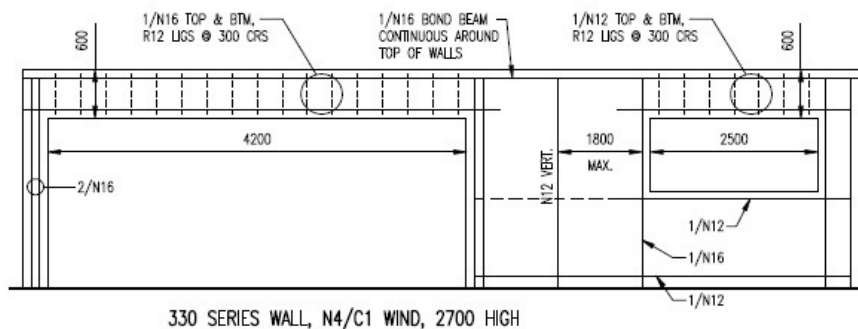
2700 High Wall, N4/C1 Wind Rating, 330 Series ECO-Block (Max. roof load width: 9.2m)
